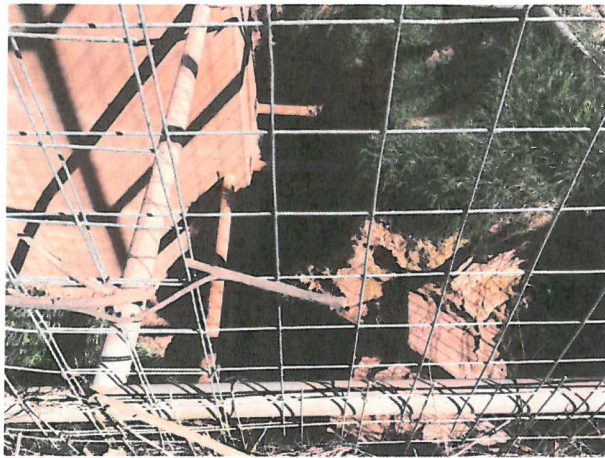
Sediment buildup and erosion at southeast face of drainage structure.
